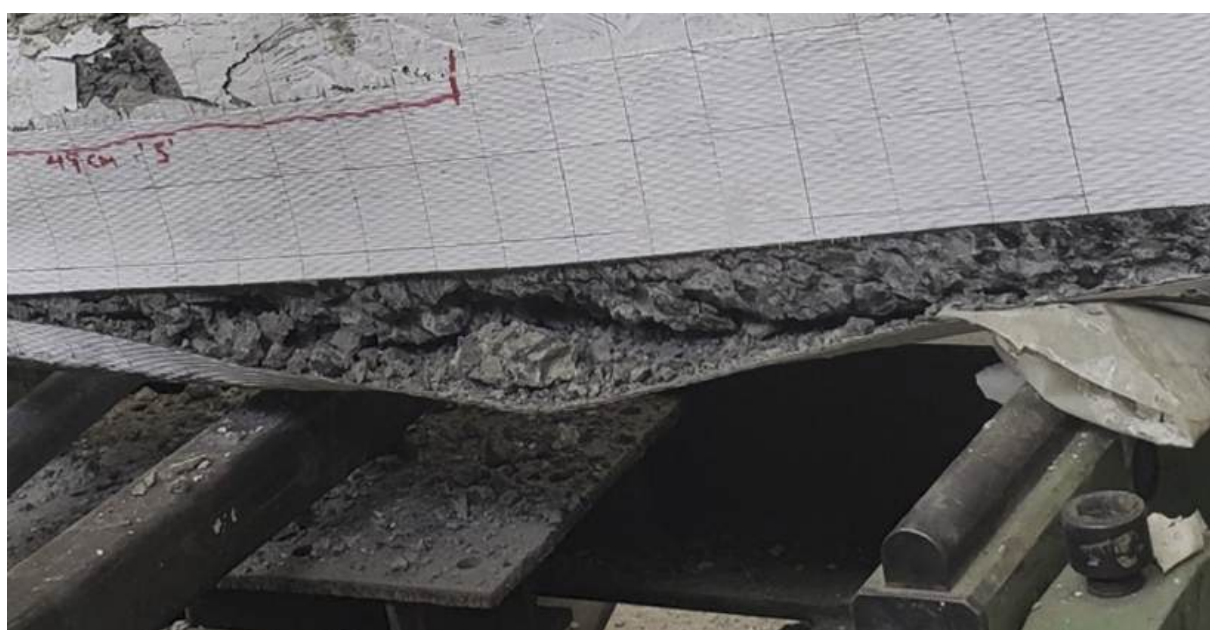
Spalled Concrete Beneath the Beam G2B-12
